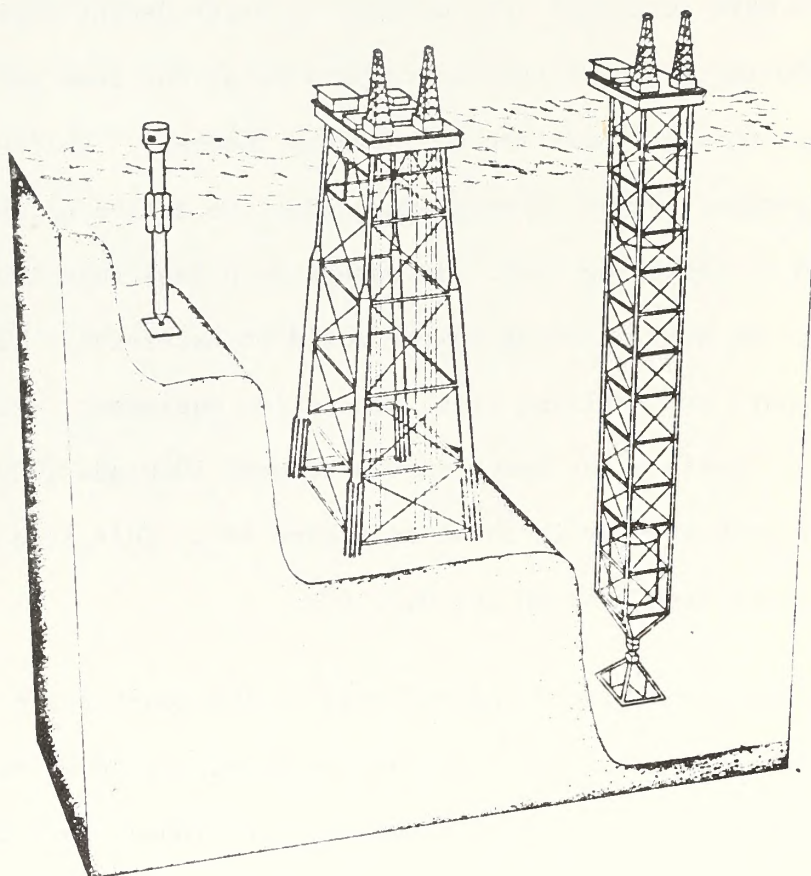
French test of buoyant tower in 325 feet of water, compared with Esso concept of 700-foot platform and 1350-foot tower.
